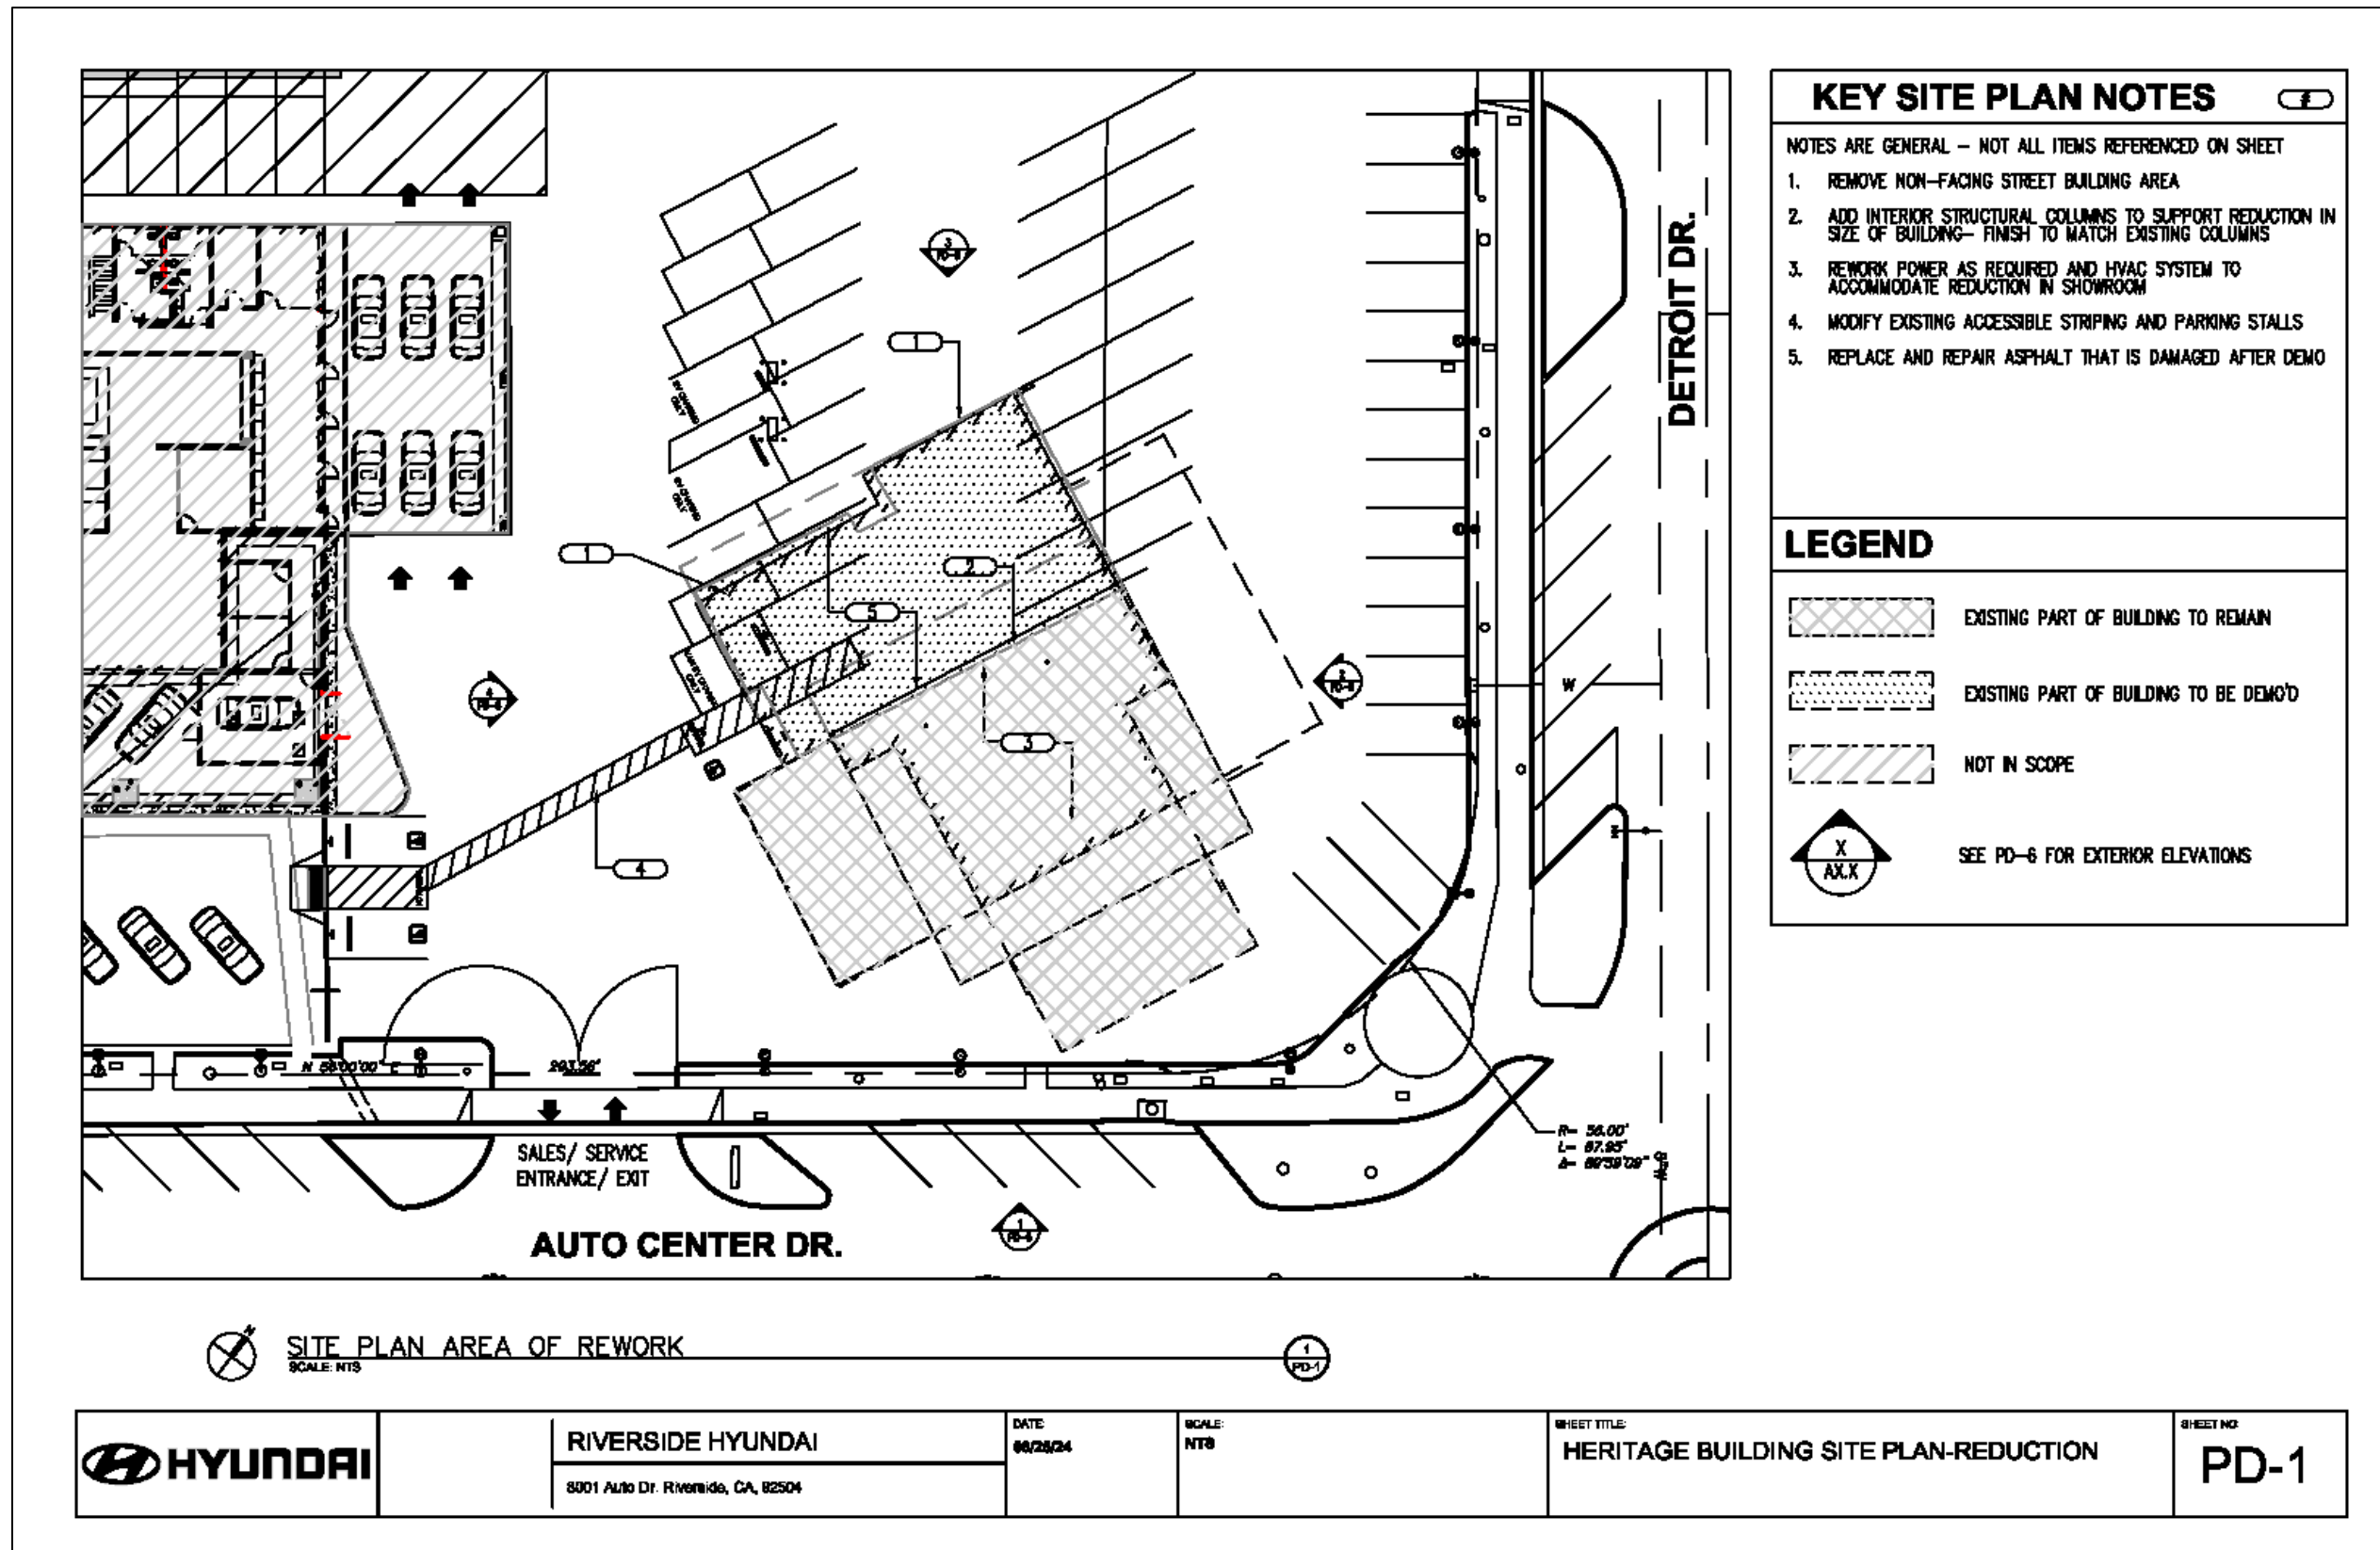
Proposed Plans for Building Reduction (Provided by Mike Khoury).
